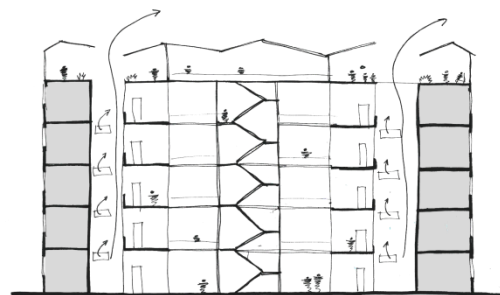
Strategy 1. Stairs out for atrium + Roof shading
